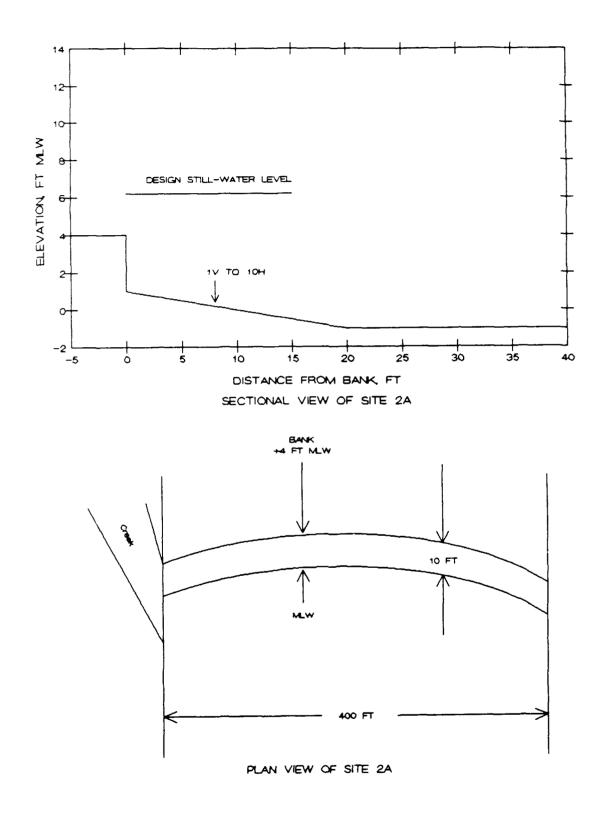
SECTIONAL AND PLAN VIEWS OF SITE 2A
